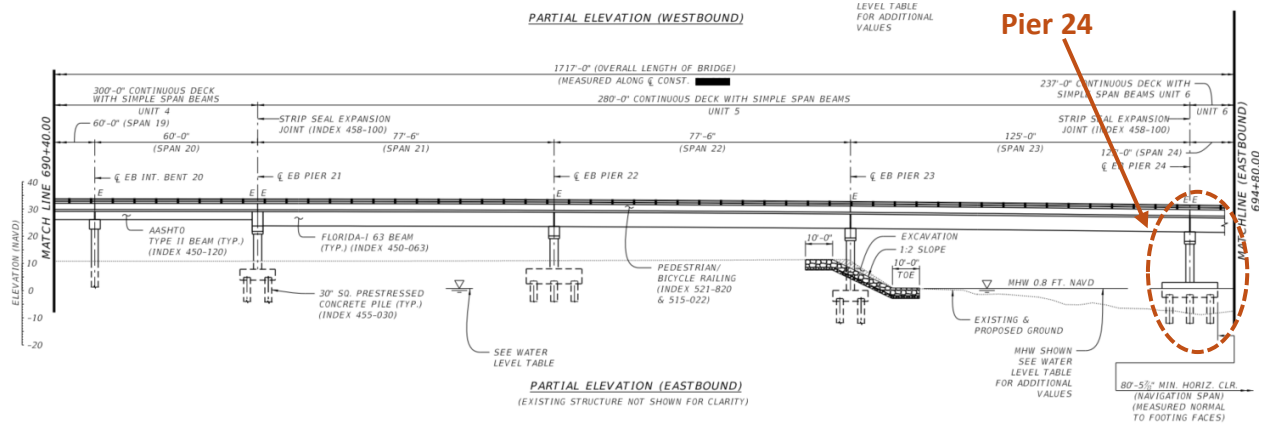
Partial elevation – Selected Pier no.24 of the Eastbound Bridge (B1-11)
